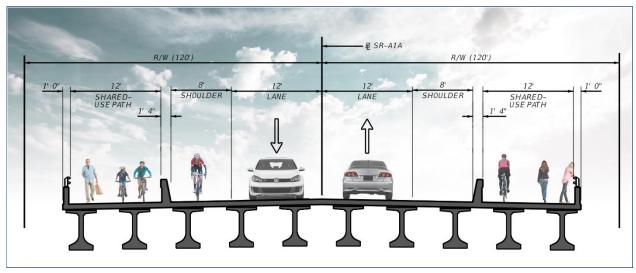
PREFERRED ALTERNATIVE BRIDGE TYPICAL SECTION
